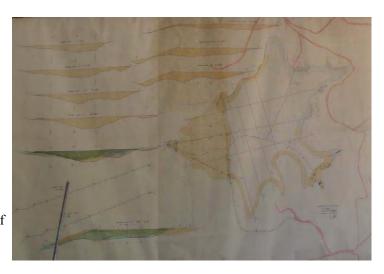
Plan and Cross Section of the Tailings Dam of the Grot Mine
